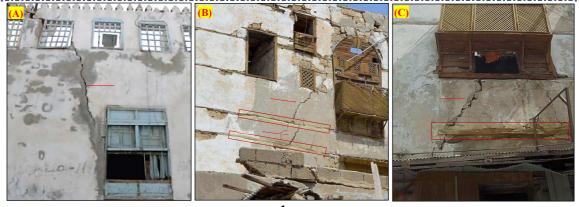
Diagonal Structural cracks in masonry loadbearing walls of some heritage buildings at historic Jeddah.
